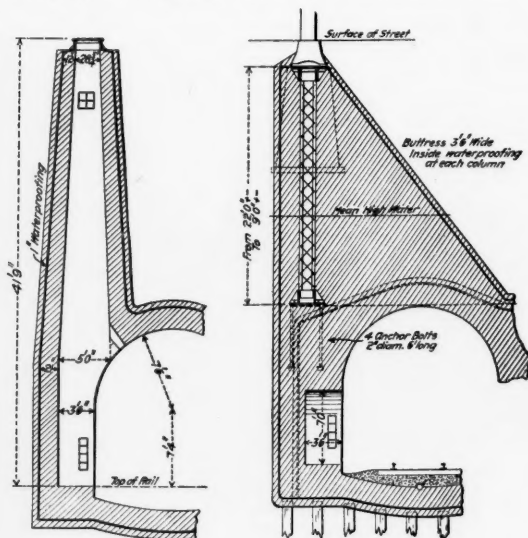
Section of Three-Track Tunnel Without Supporting Columns.
